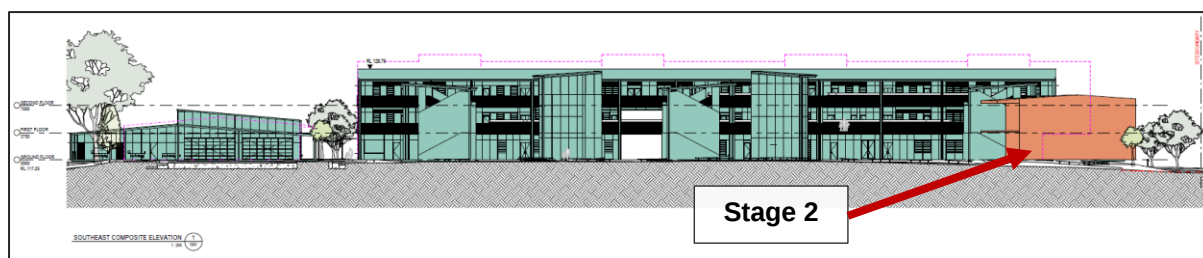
| Stage 2 south-east elevation (Source: Applicant's RtS 2021)
